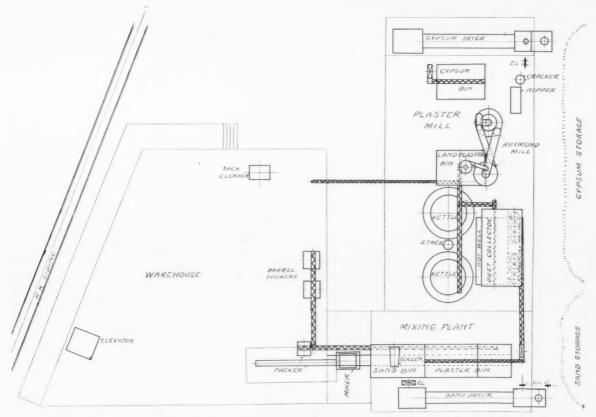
General layout of plant of Connecticut Adamant Plaster Co., New Haven, Conn.
